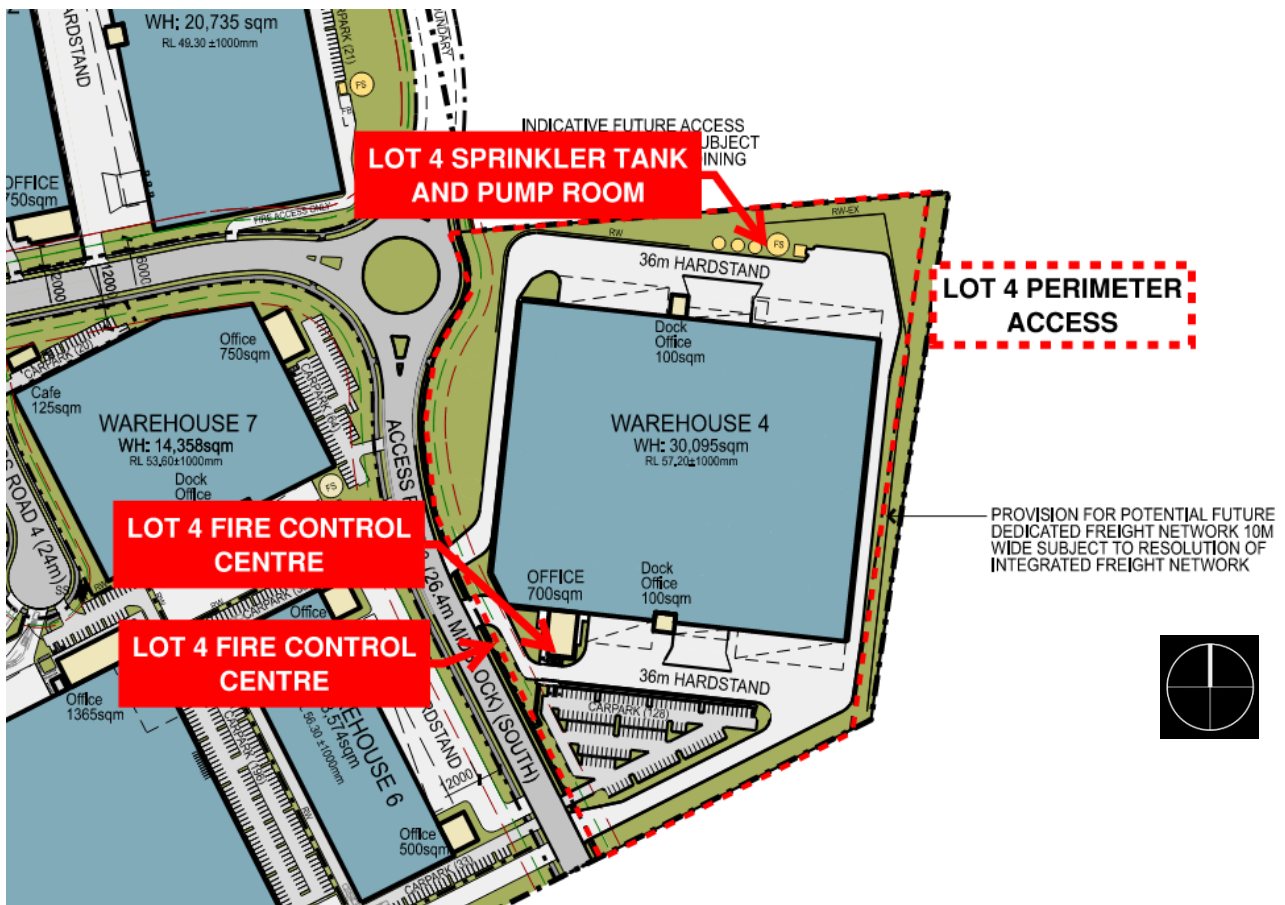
Fire Brigade Access and Site Facilities – South-Eastern Side
